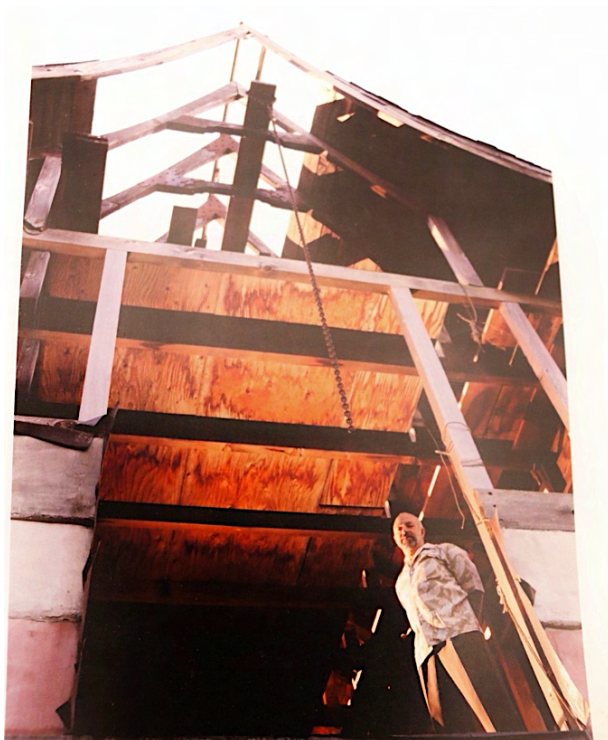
David Lee Hoffman with Teahouse under construction c. 1987.
